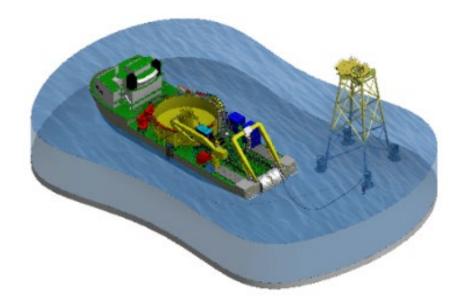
First end cable pull-in and vessel laying away (illustrative image only; note that Moray West utilises monopile foundations, not jacket foundations)
